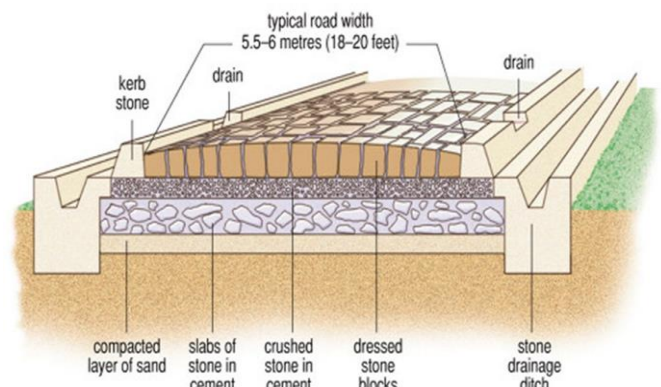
Ancient Roman Road Section (source: Google - Reddit.com)
